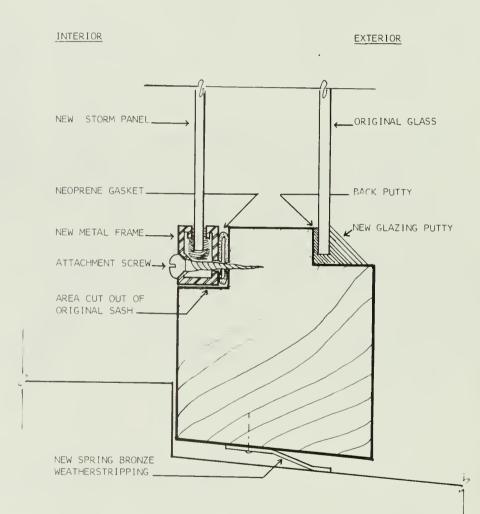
Detailed section through the wooden sash rail with storm panel in place. Note the small area of wood cut out to recess the new storm panel. The cavity left between the two glazing layers is 1 inch which is within the optimum range on 1/4 inch to 1½ inch for insulated glazing. Note the neoprene gasket that acts to seal out moist air between the storm panel and the wooden window.
